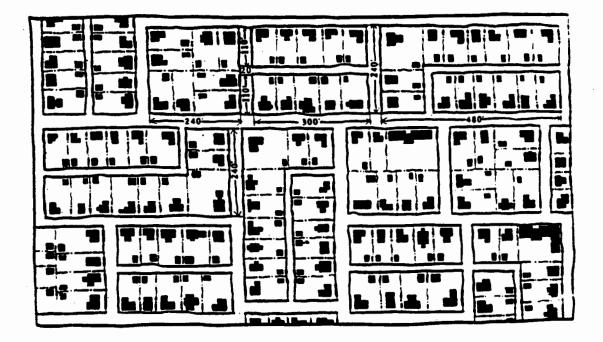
Diagram of a street defining geometrically shaped blocks. Where a street is long, traffic calming devices should be considered. A basic street block diagram must be prepared for each village center.
